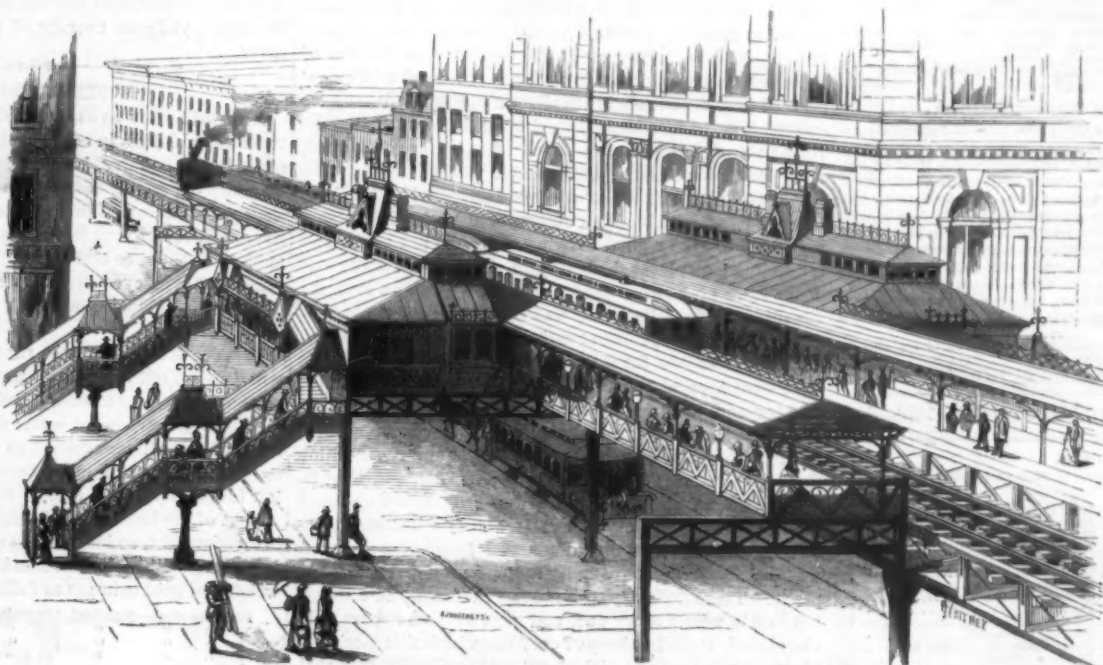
ELEVATED RAILROAD STATION, 23D STREET, NEW YORK
